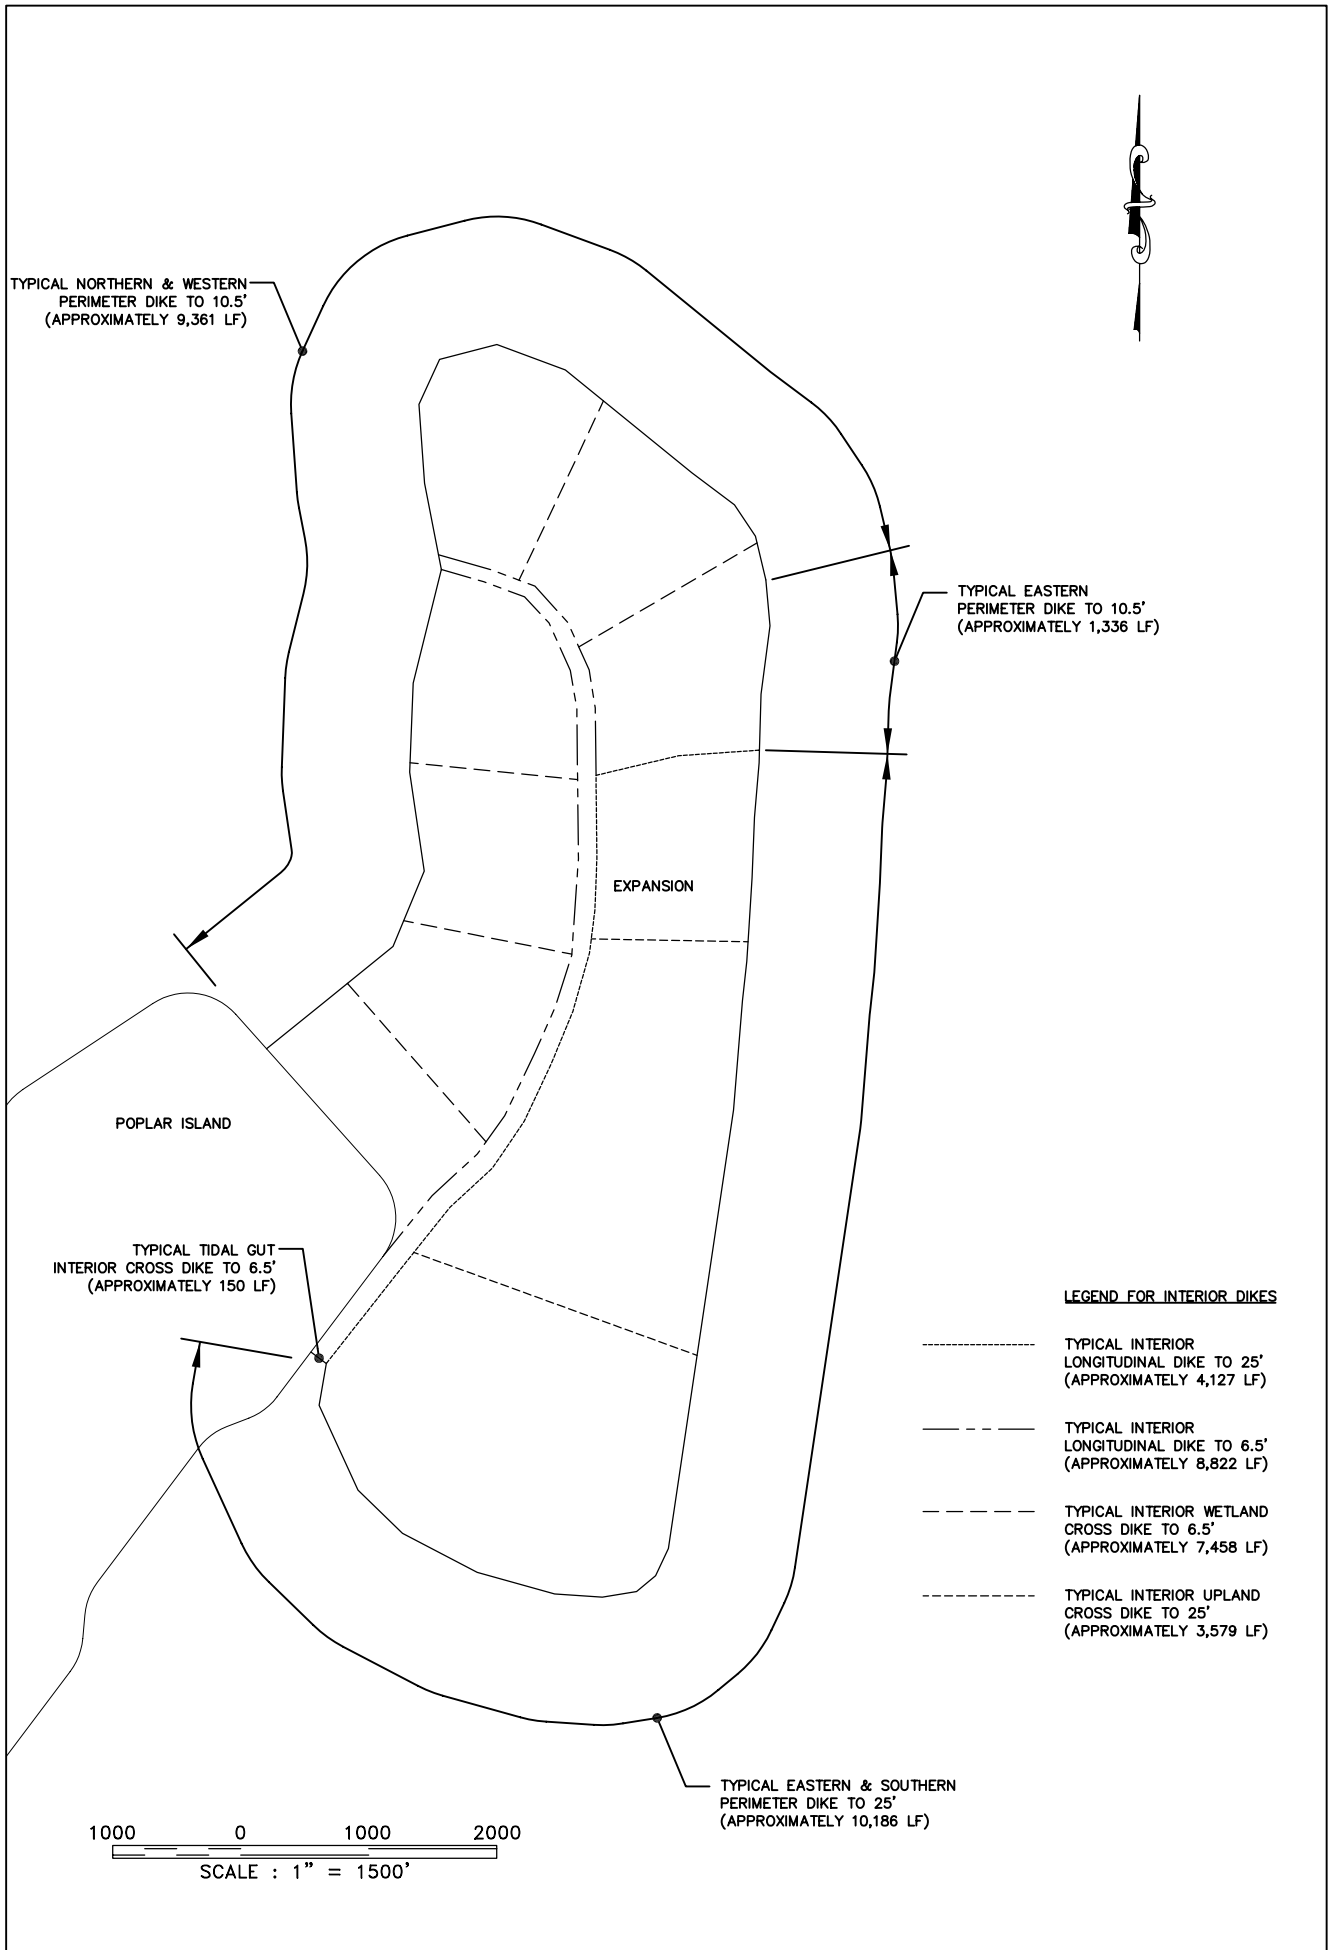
Layout of Typical Sections for 50% Wetlands/50% Uplands Option
